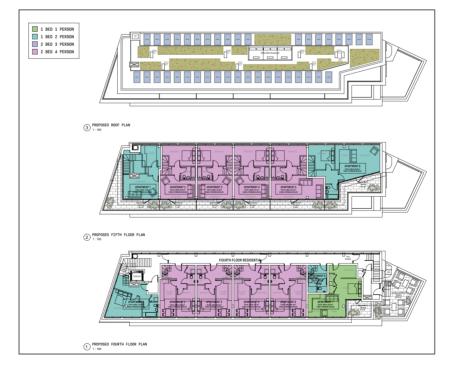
Proposed Site Layout - fourth, fifth and roof plans (Child Graddon Lewis, June 2022)
